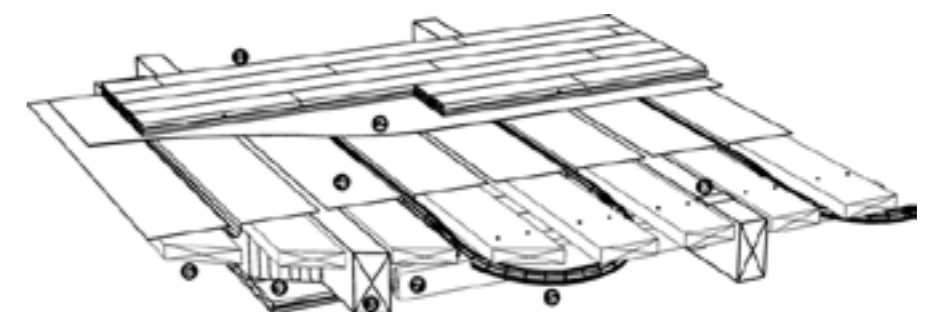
Floor heating built in between battens/joists (outline sketch)
